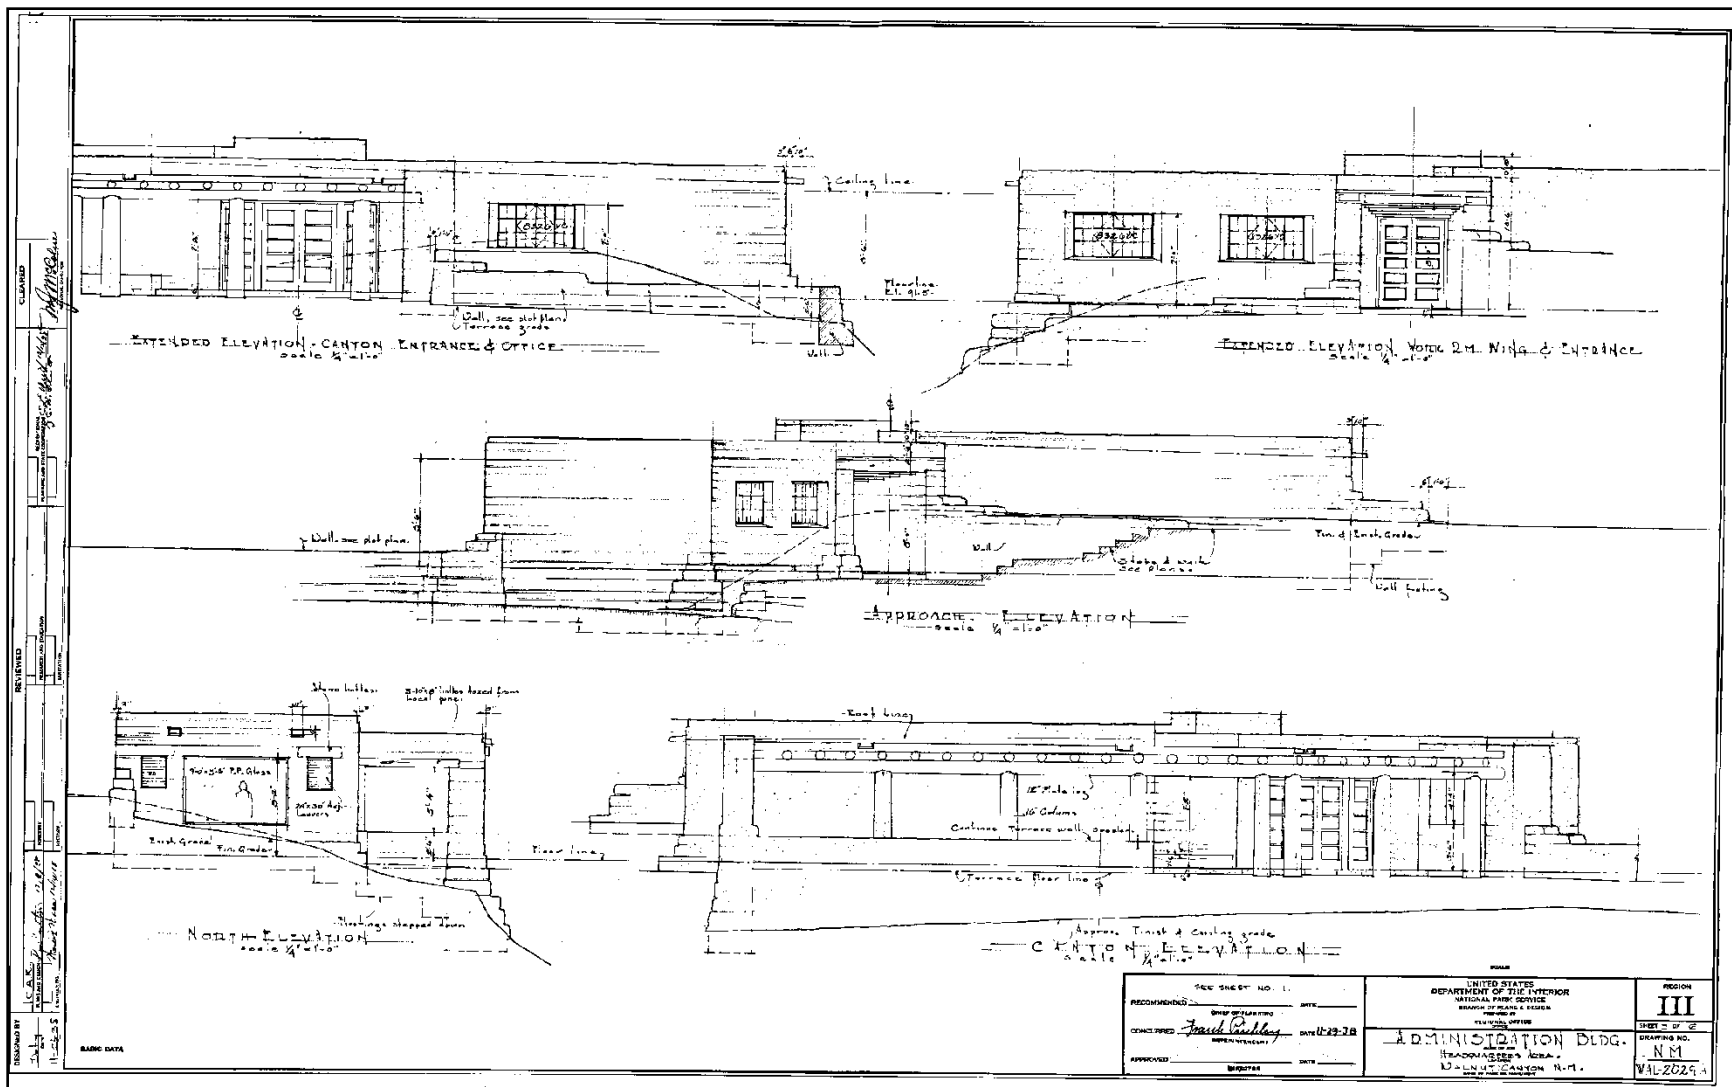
Elevation drawings for Administration Building (NPS Dwg NM-WAL 2029A, sheet 3), 1938, drawn by Cecil Doty.
